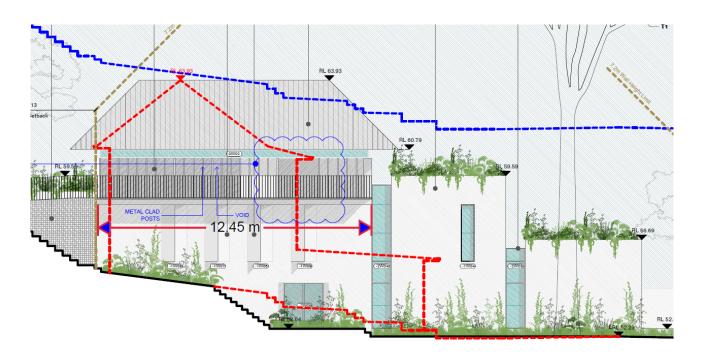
North elevation with maximum unarticulated wall length shown by red arrow (Source: Common Office, overlay by Council).
